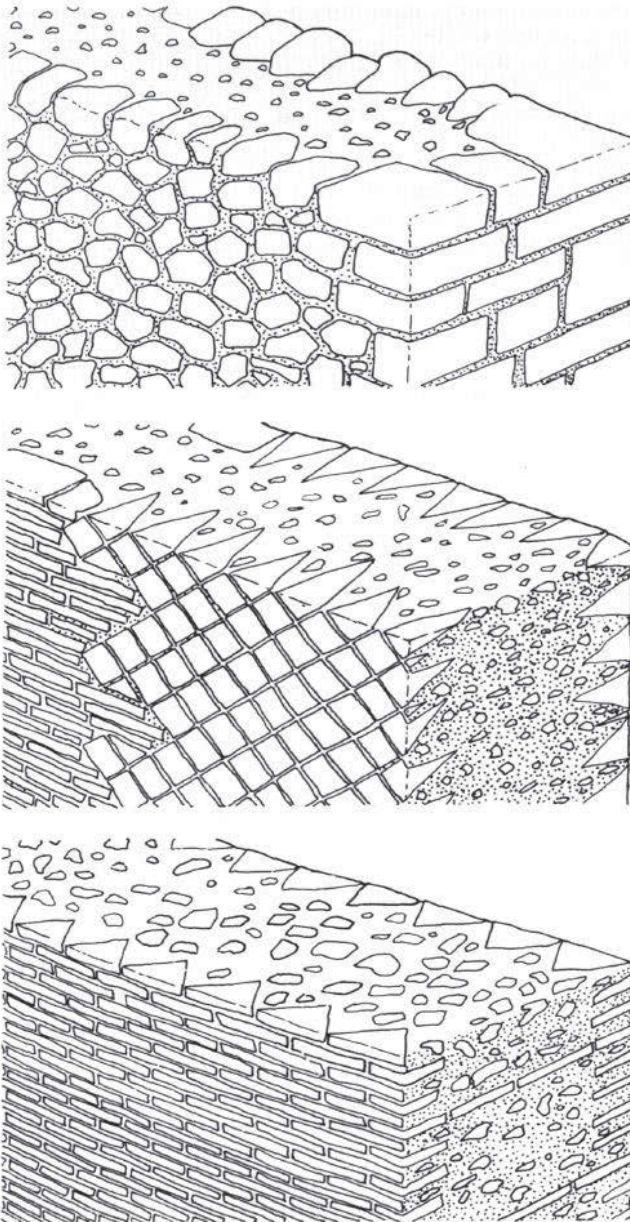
Concrete wall with facings of opus incertum (top), opus reticulatum (centre), and brickwork (bottom) (Drawn by R Lea, after Leacroft 1969, fig 10)
